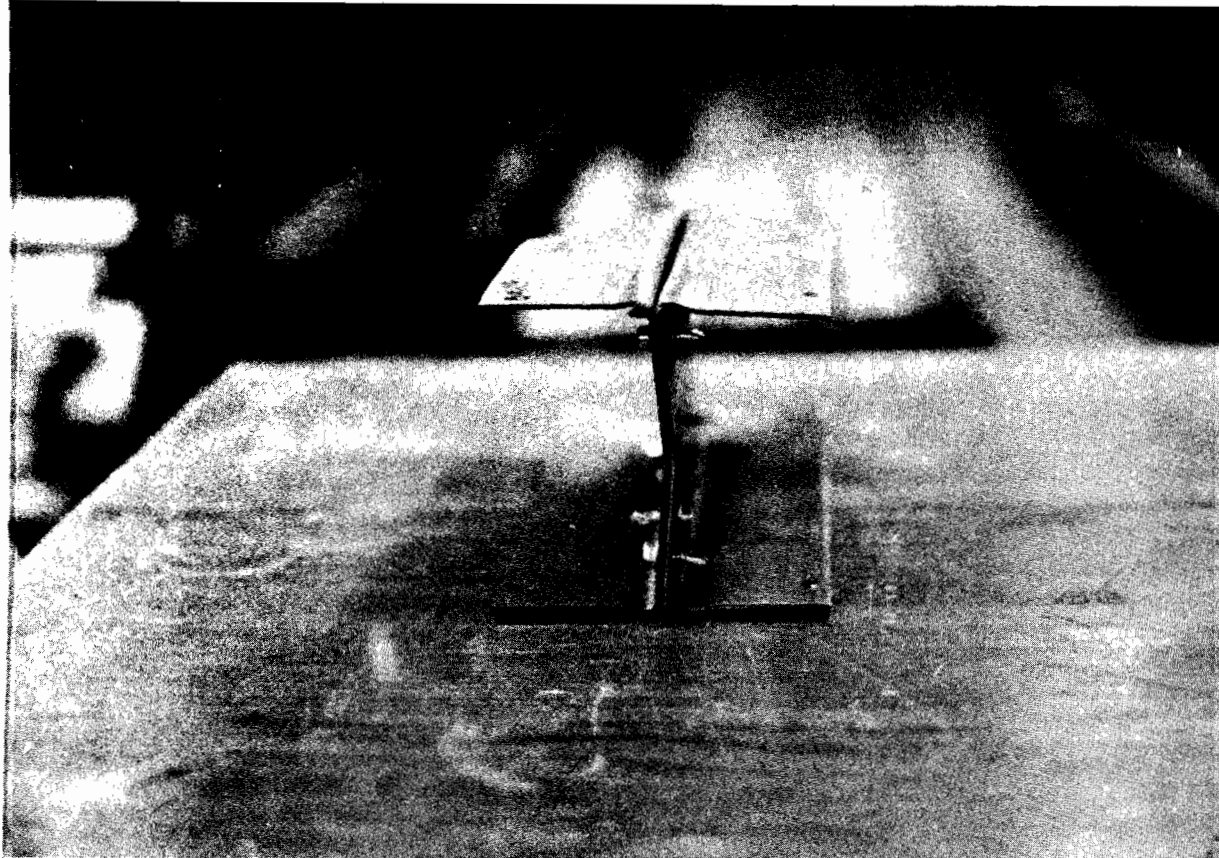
Photograph Showing Typical Failure of I-Beam
